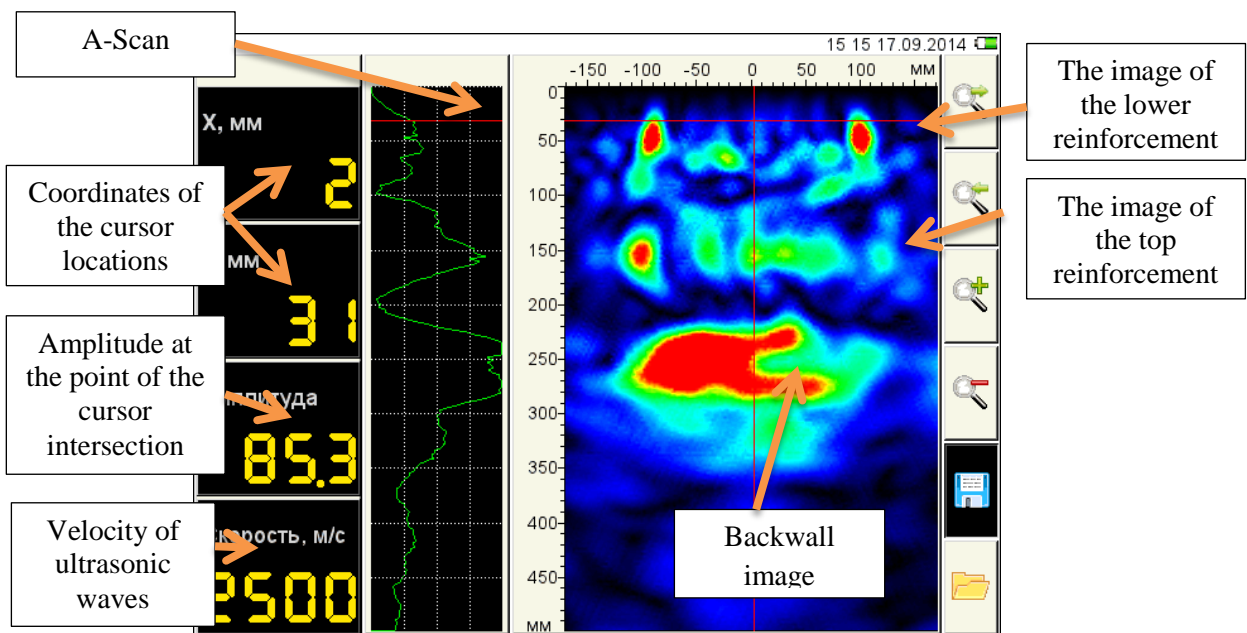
Scan of the 250-mm flooring with images of the nearby and distant rebars and the backwall image.
